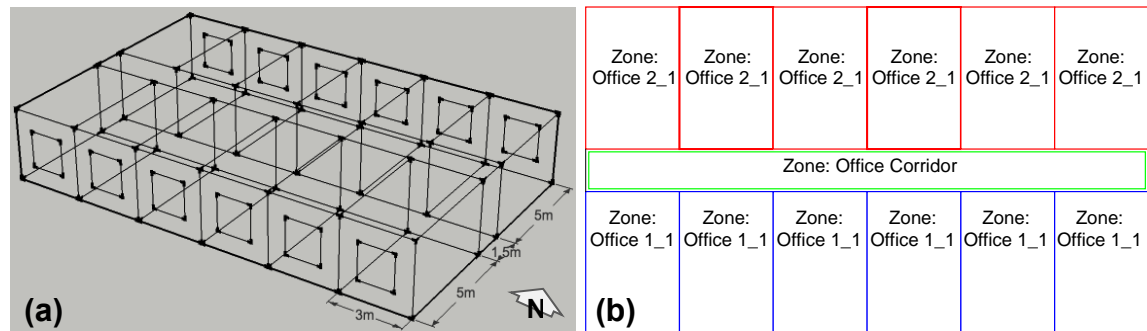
Case study commercial building. (a) 3D simulation model. (b) Thermal zoning and floor plan.
